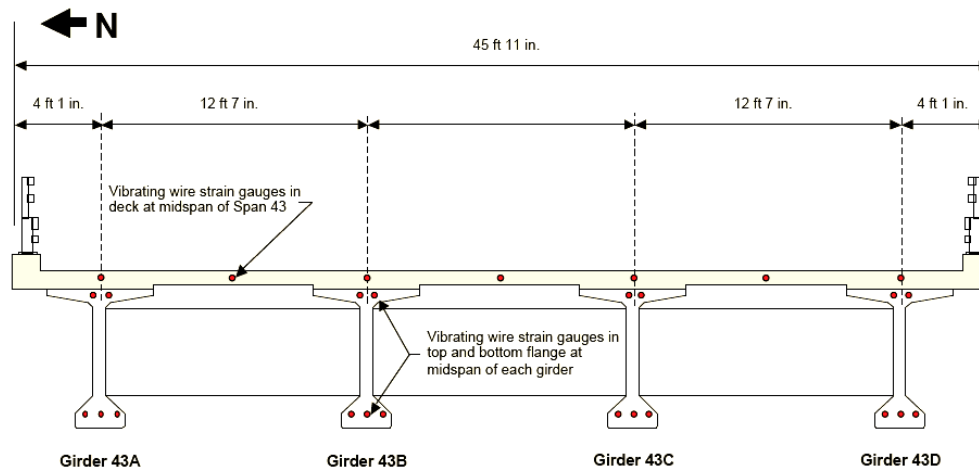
Location of VWSGs in Bulb-Tee girders in the Rigolets Pass Bridge (Roller, Russell et al. 2011)
